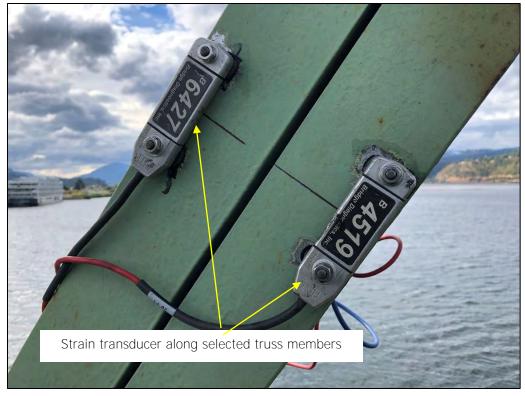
Strain transducers along selected Span 3 & 4 truss members (typical)
